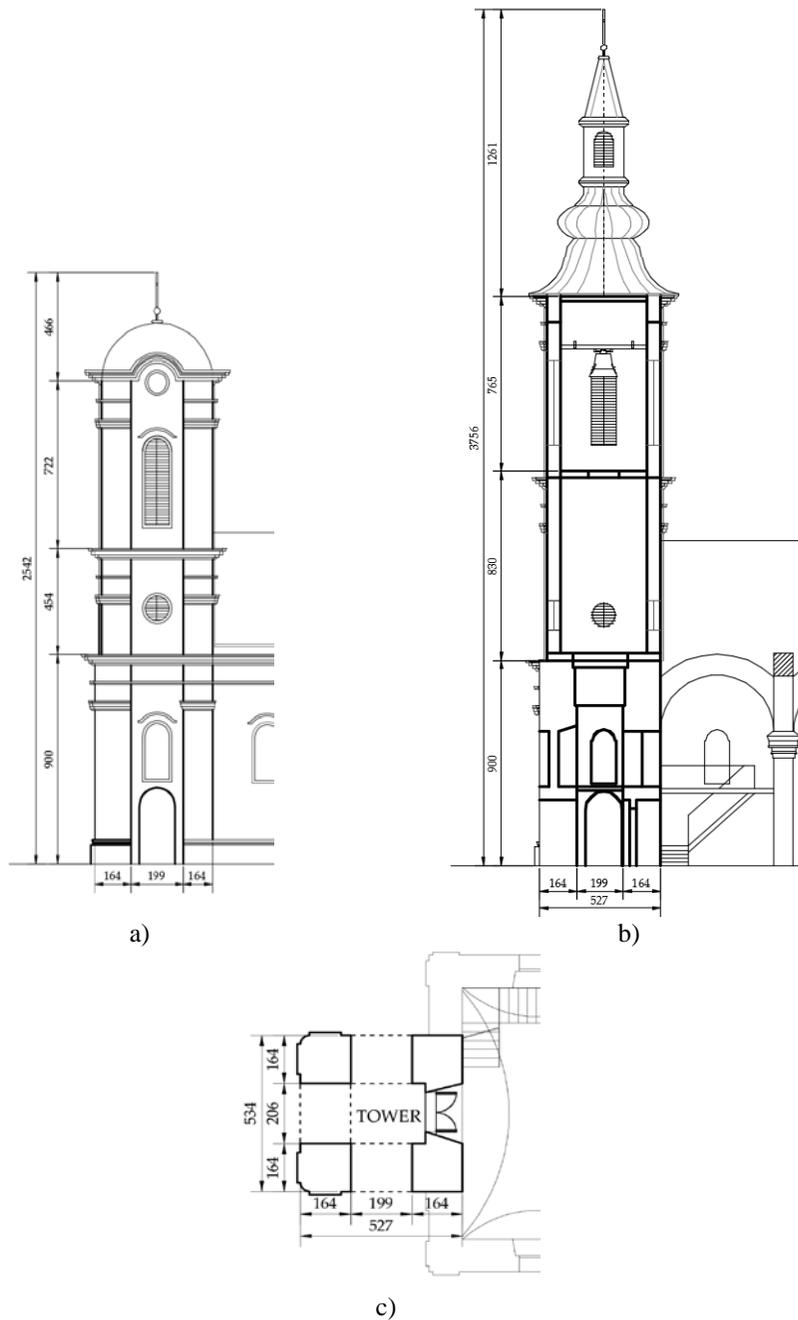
Elevation and cross-section of (a) existing and (b) upgraded structures, and (c) plan view of the lowest storey
